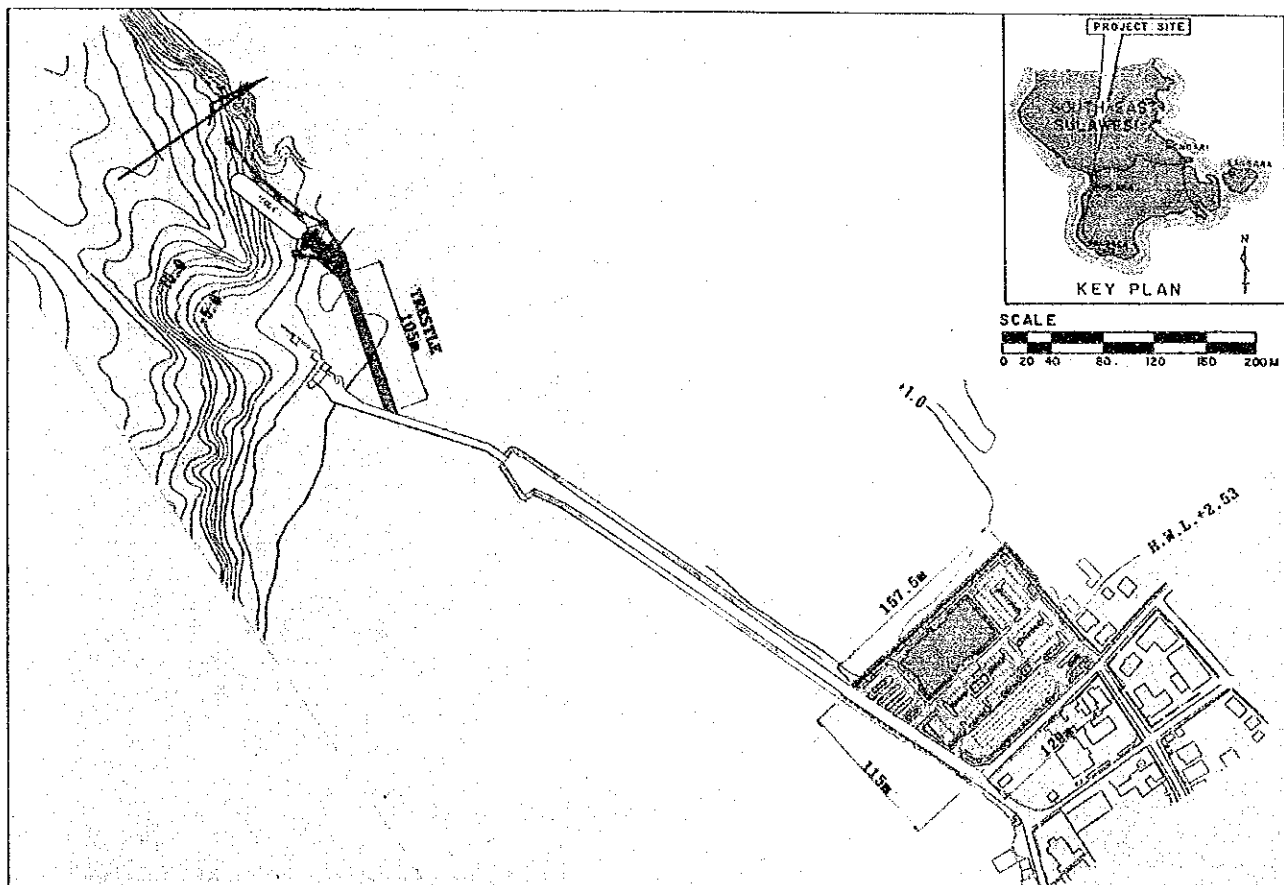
Layout of Kolaka Ferry Terminal
